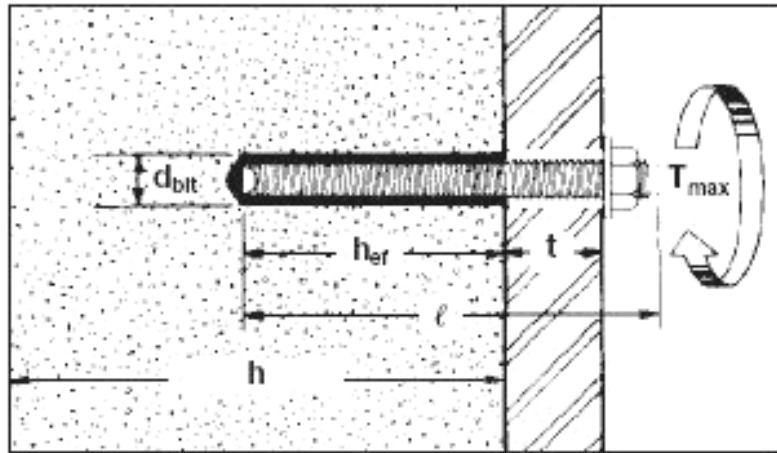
Installation of an HAS-E Adhesive Anchor
